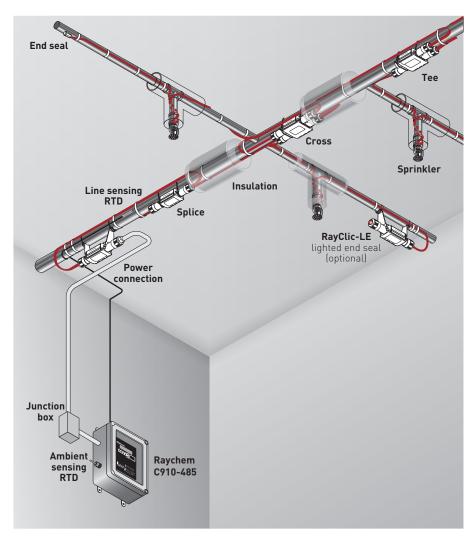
Typical fire suppression system for branch lines with sprinklers
